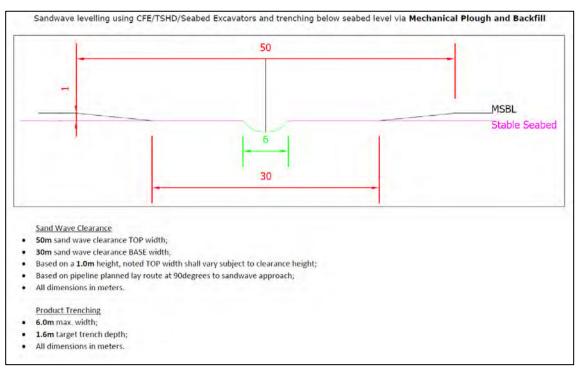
Proposed Cross Section of Sand Wave Levelling and Trenching by Mechanical Plough and Backfill
